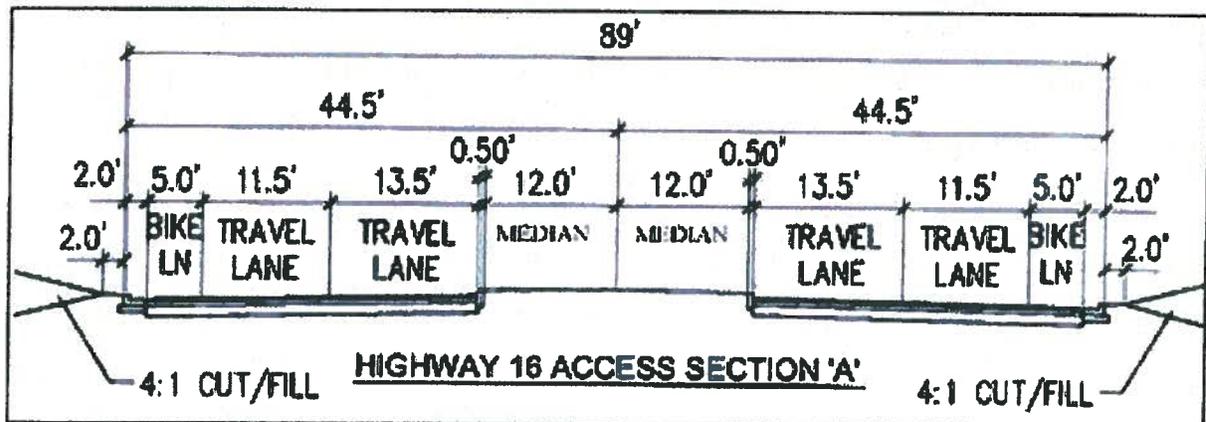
Cross-Section of Proposed State Highway 16 Access Road.
